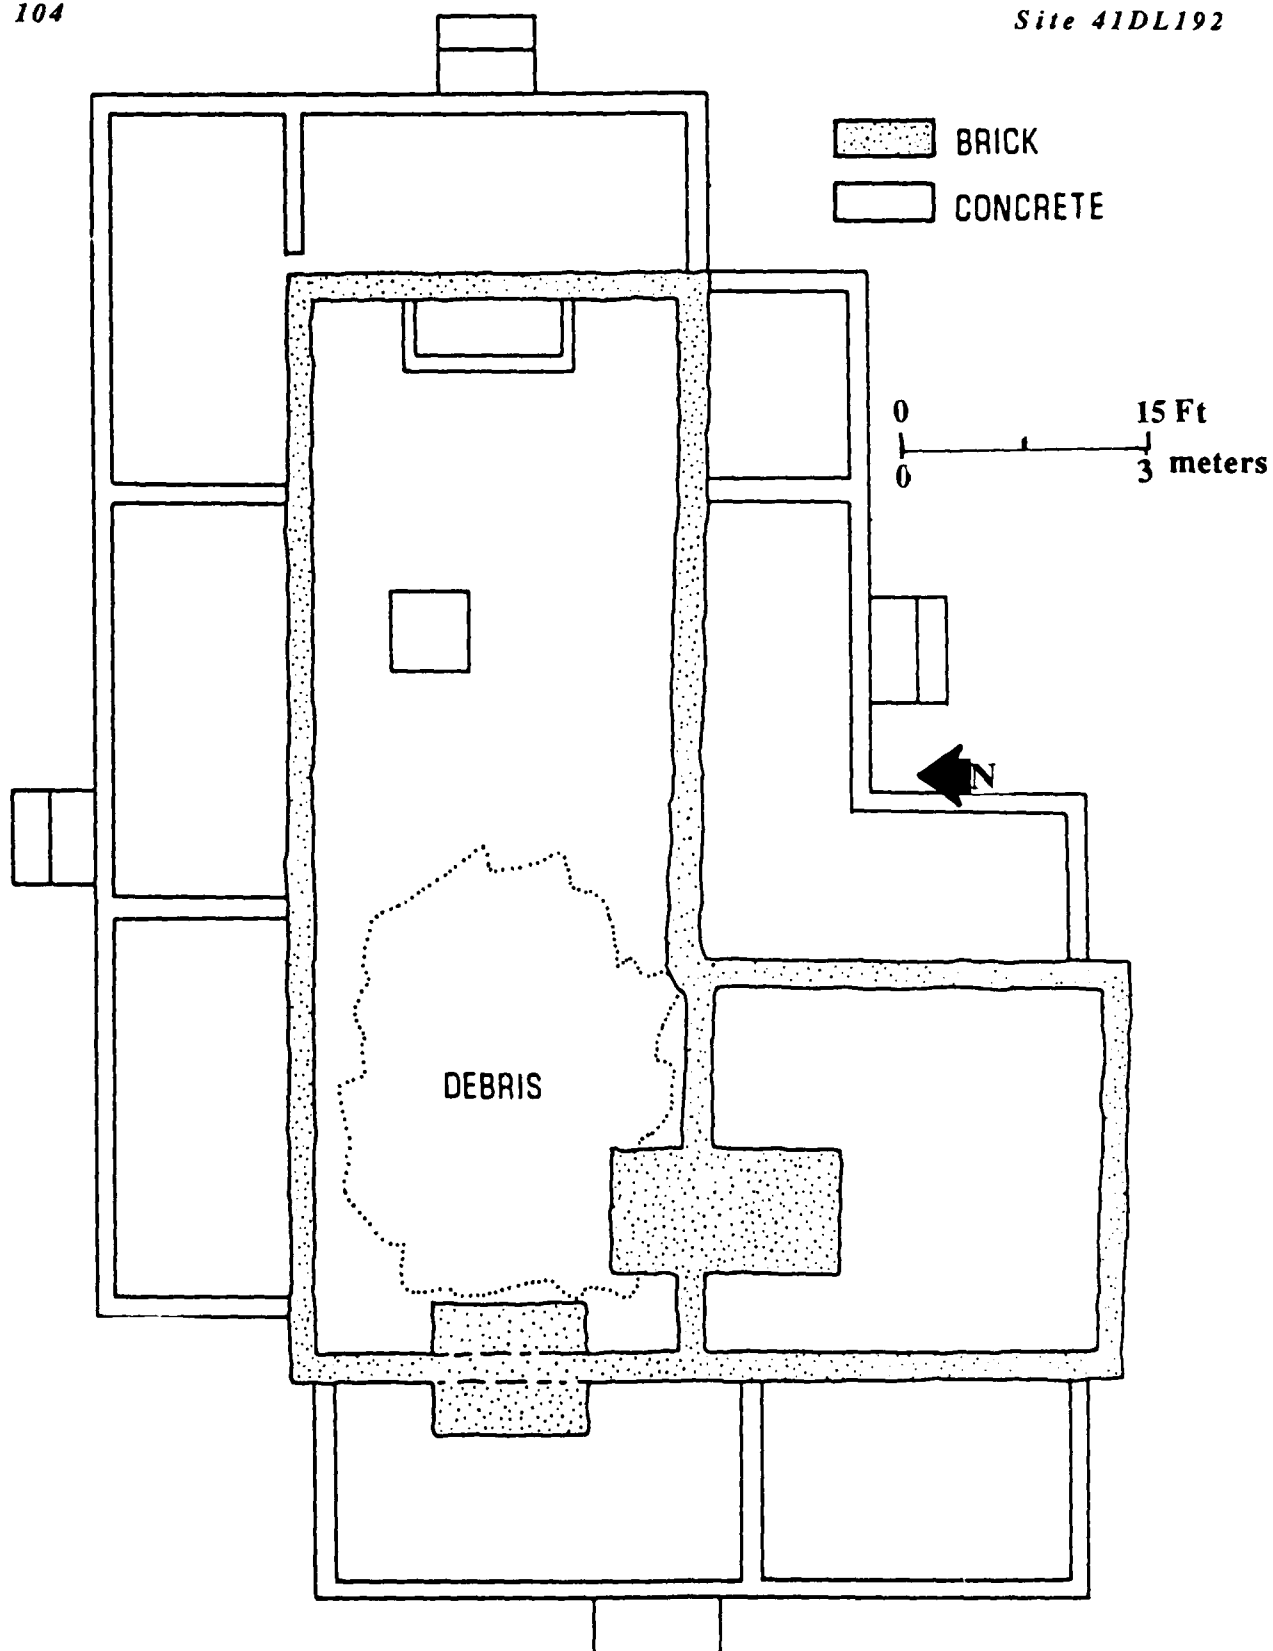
Plan view of the foundation footings of the 1876 Penn House (map provided courtesy of Texas Parks and Wildlife).
